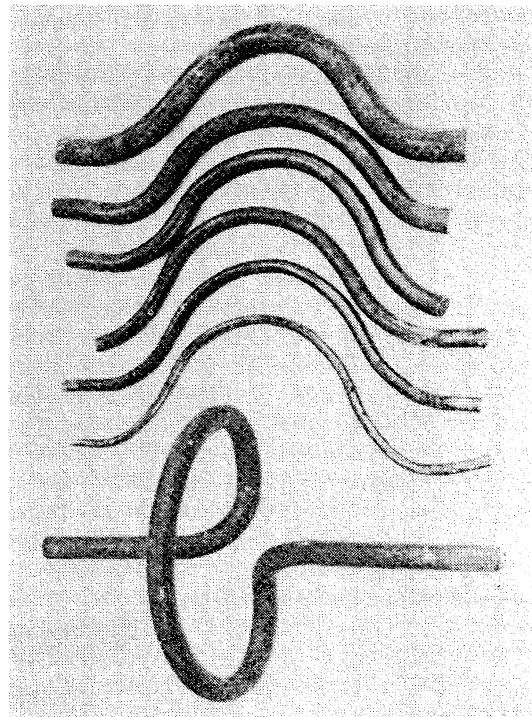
FAILED BENT-BAR DAMPERS FOLLOWING TESTING [11].
